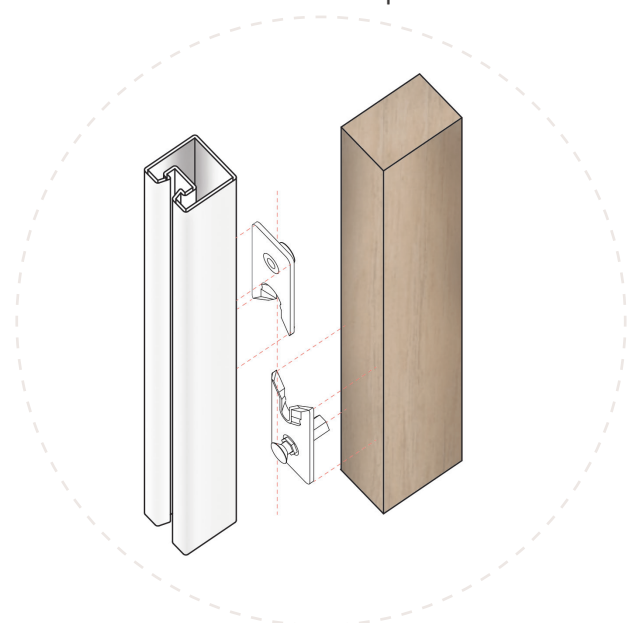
Top hanging Ricon connector for fixing steel and timber (source: author)
